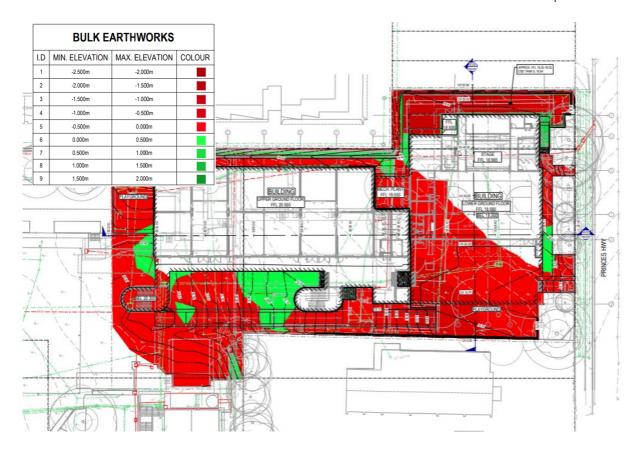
Bulk Earthworks Plan (Meinhardt, 2025)
